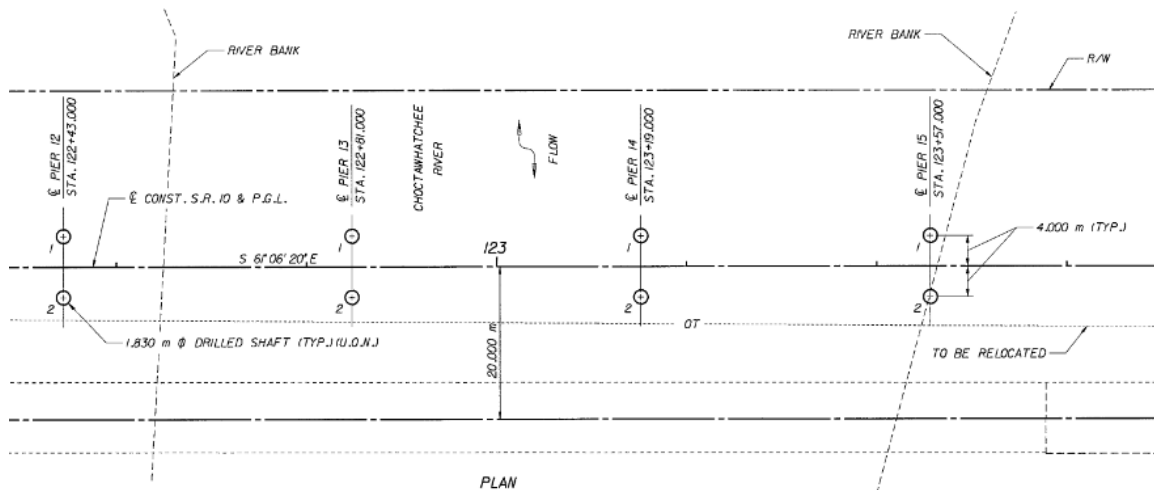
Caryville bridge drilled shaft layout for Piers 12 to 15.
